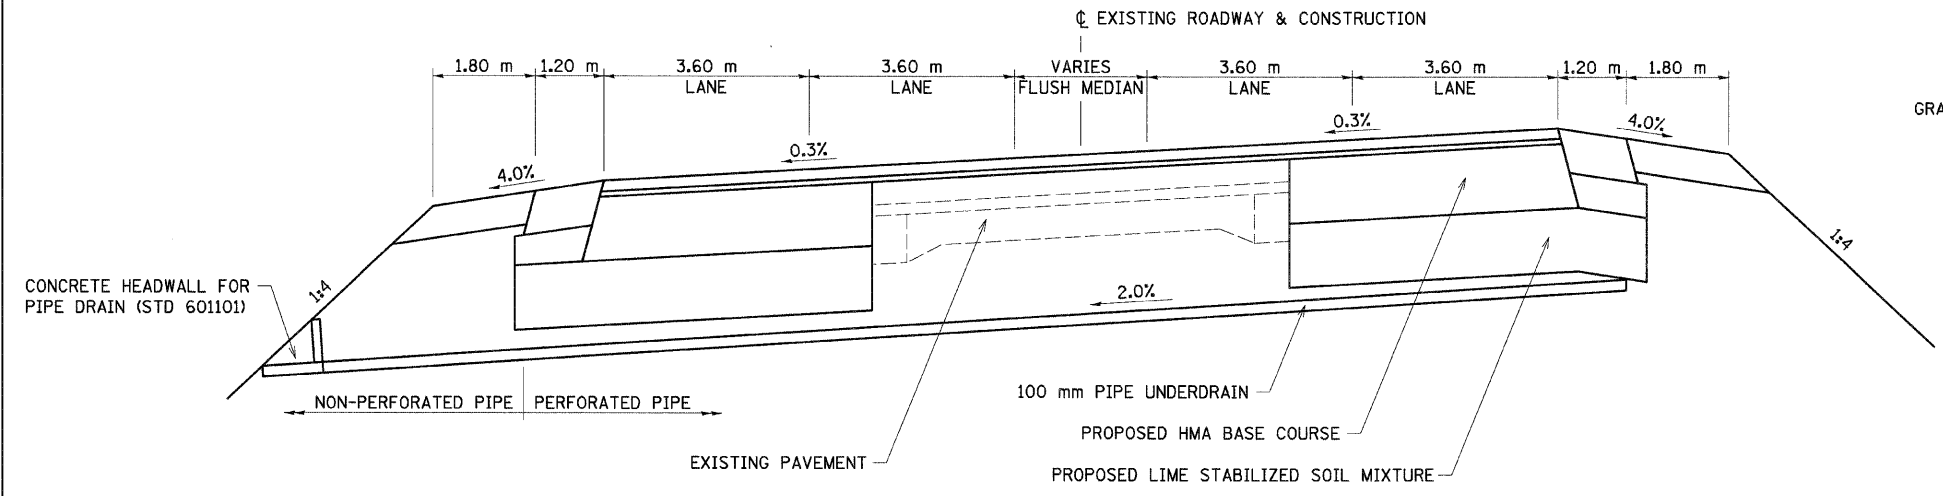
DETAIL OF PAVEMENT TERMINATION FOR ACCESS ROAD
